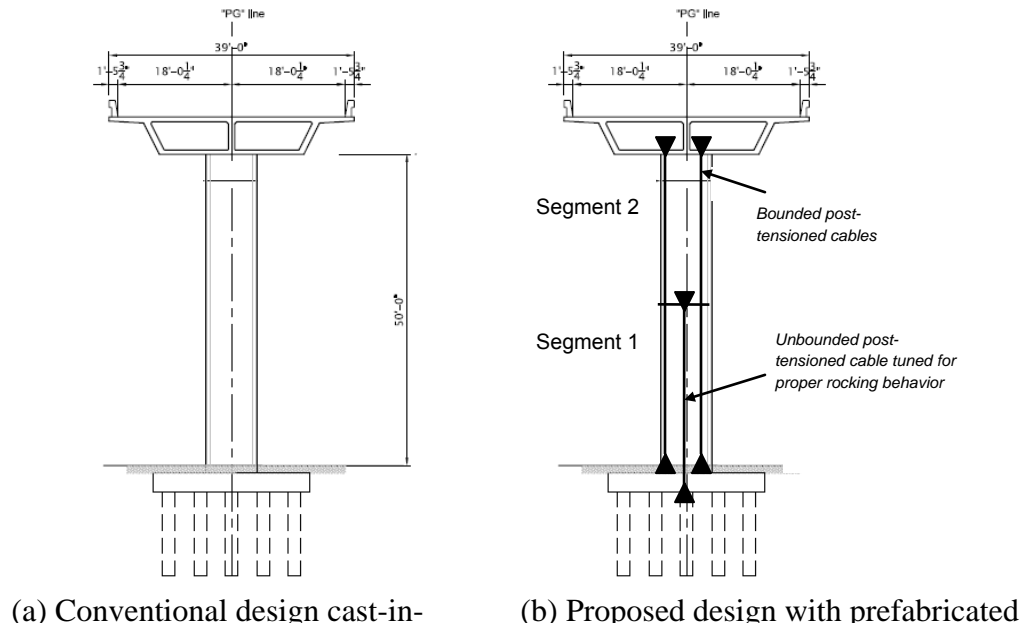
Typical single column bridge section designed by the Californian DOT (CalTrans)
